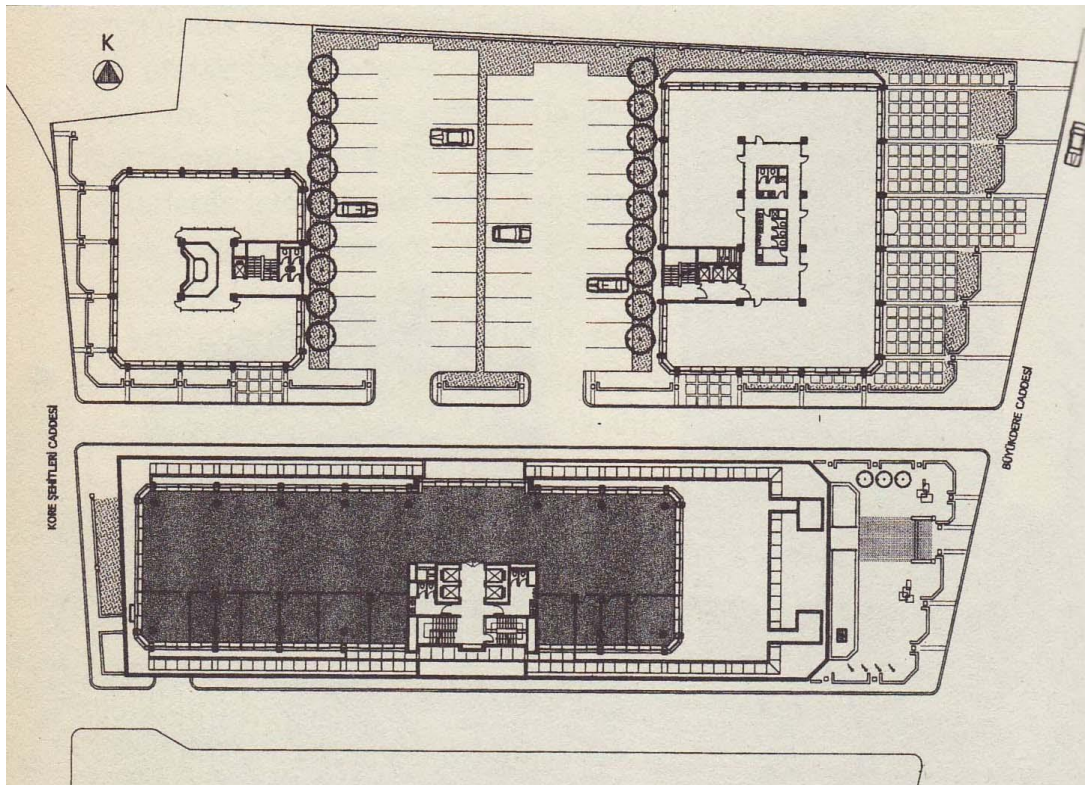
Bank and office building complex, floor plan. (Ekinciöglu, 2001c).
